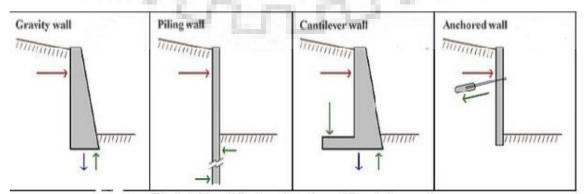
Simplified explanation of Retaining wall (www.wikipedia.com)
